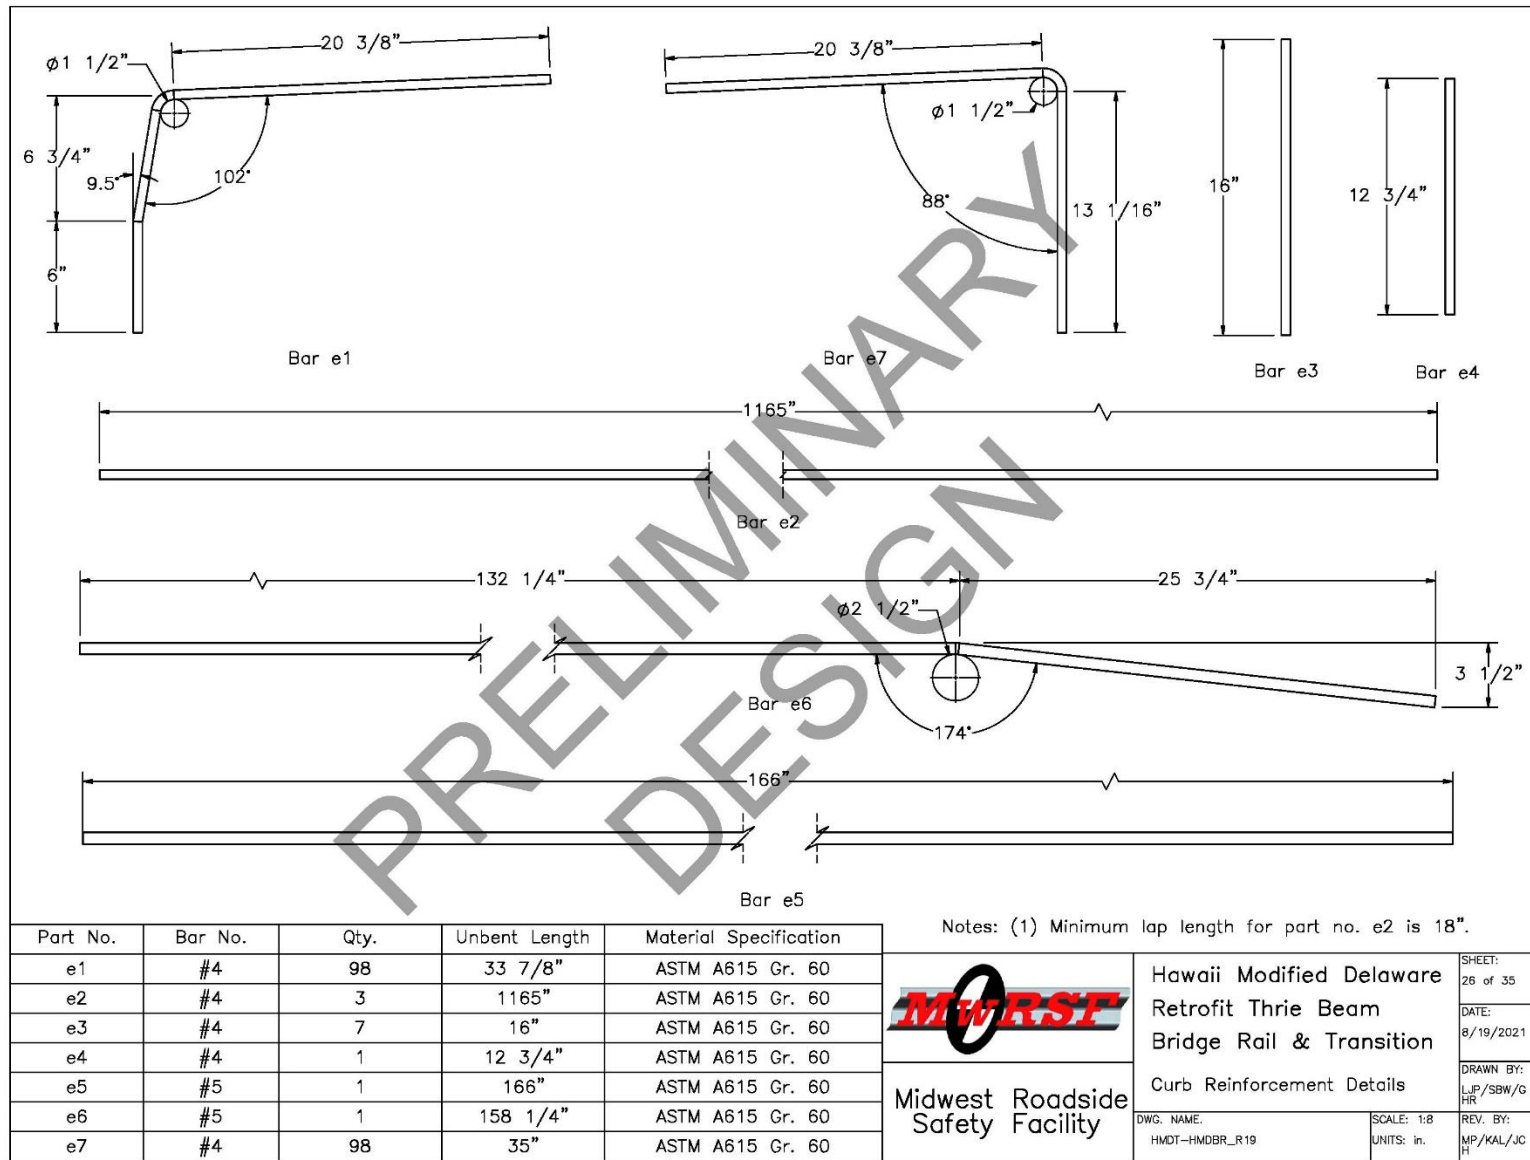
Curb Reinforcement Details, Test No. HMDT-1
